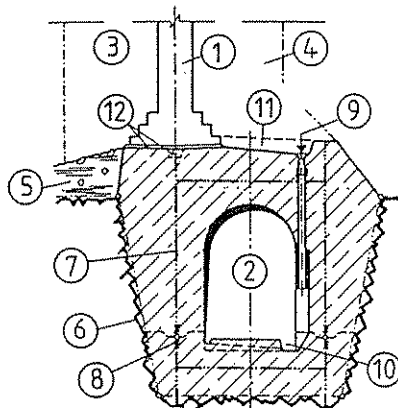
Embankment dam with internal sealing of asphaltic concrete. Junction of the membrane and a gallery structure (adapted from Haug & Rothacker 1989).
